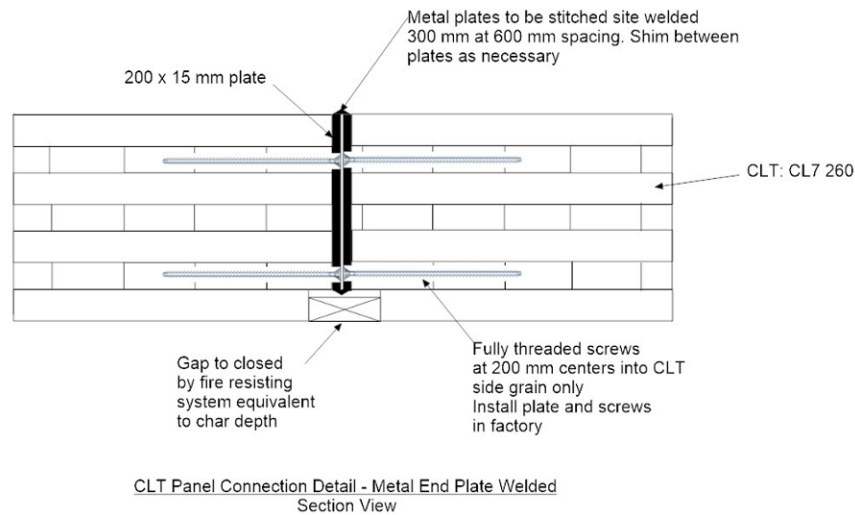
Mechanical Connection using Welded Metal Plates
